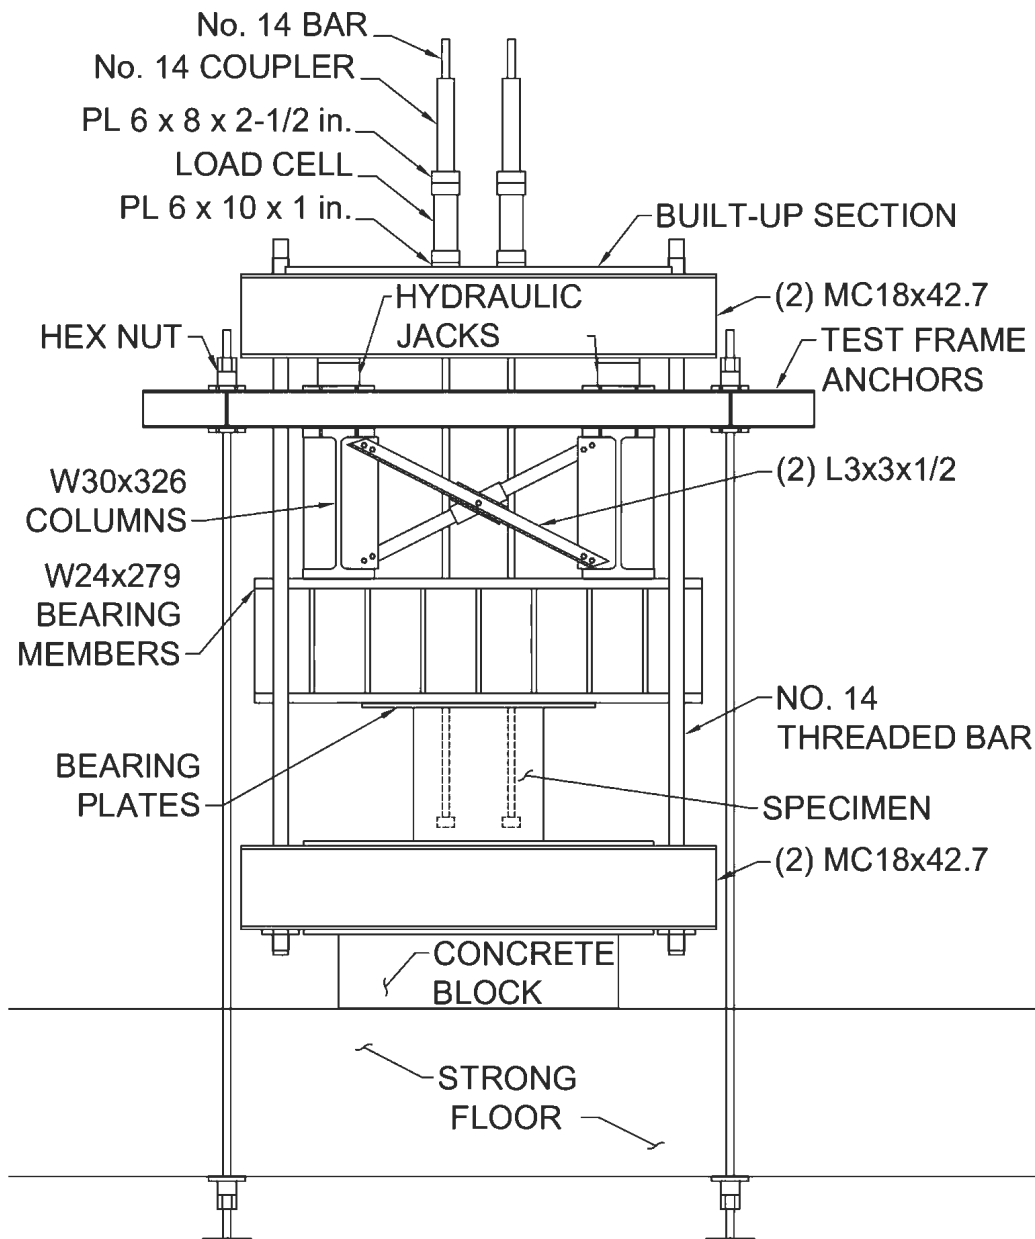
End-elevation of the reaction frame for the No. 14 bar setup
